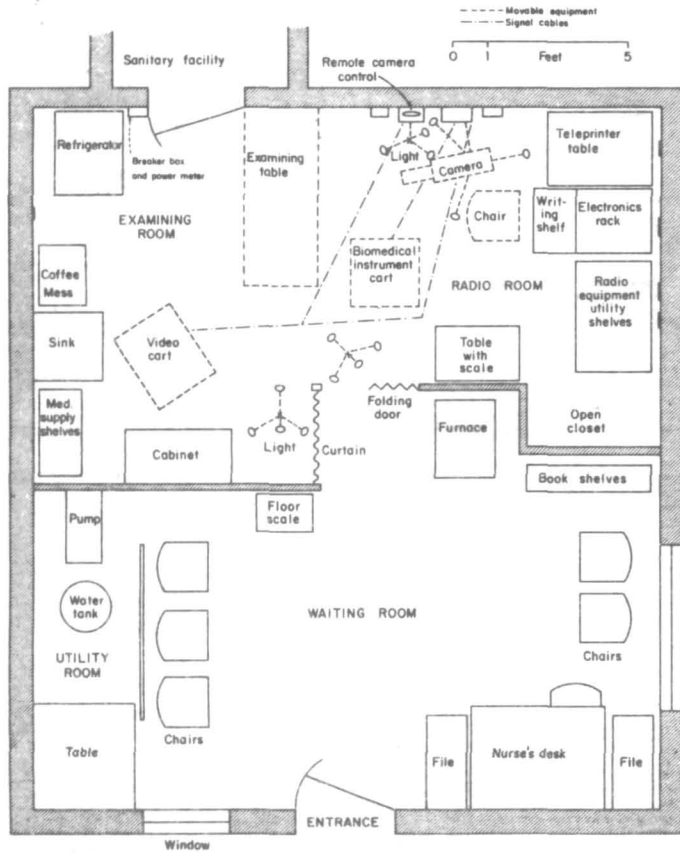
Equipment layout in Galena clinic examining room/radio room.
